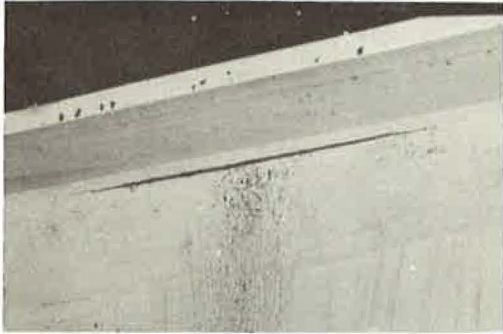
Crack in compression side of web along the toe of the web-to-flange fillet weld.
